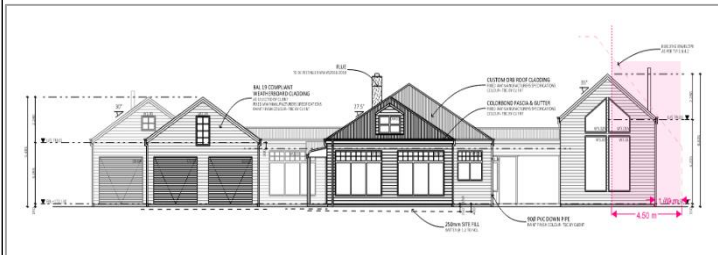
Eastern elevation with area of building envelope protrusion highlighted
